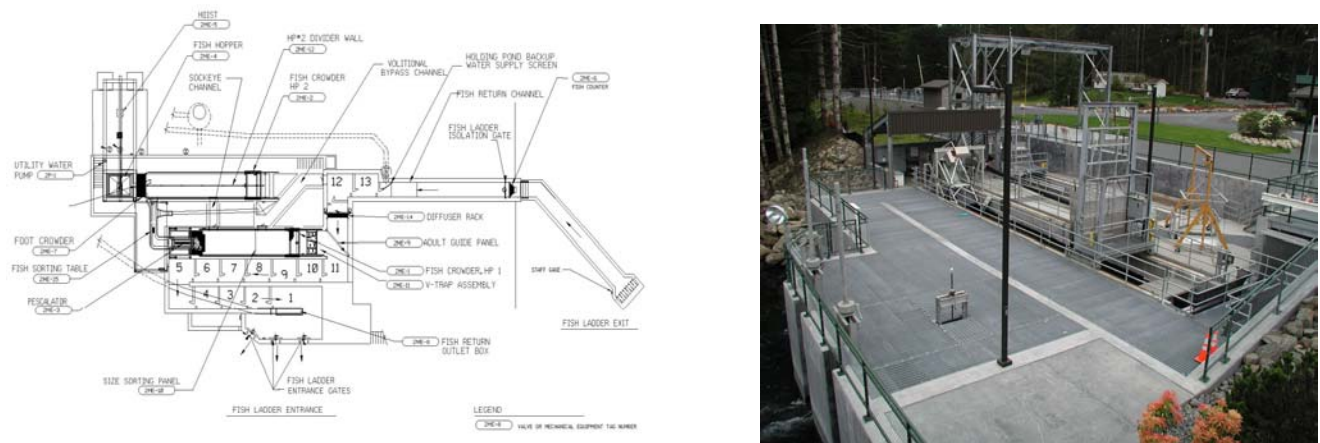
Layout of Landsburg Dam Fish Ladder and Sorting Facility
